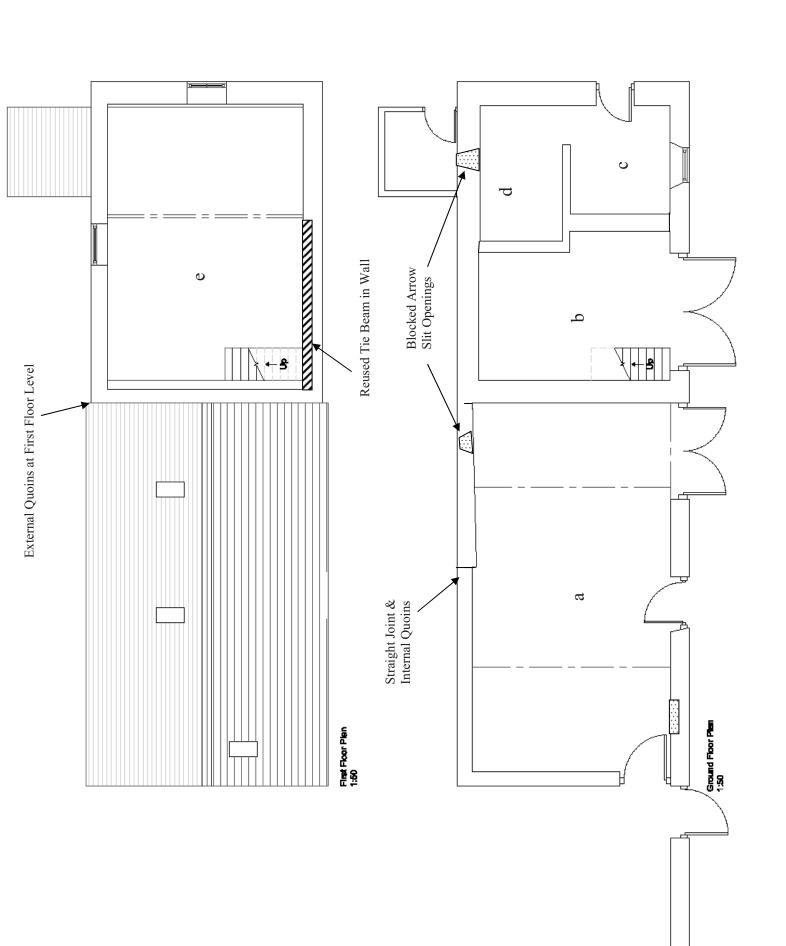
Existing Site Plan (Original Drawing Supplied by Client, Not to Scale)
